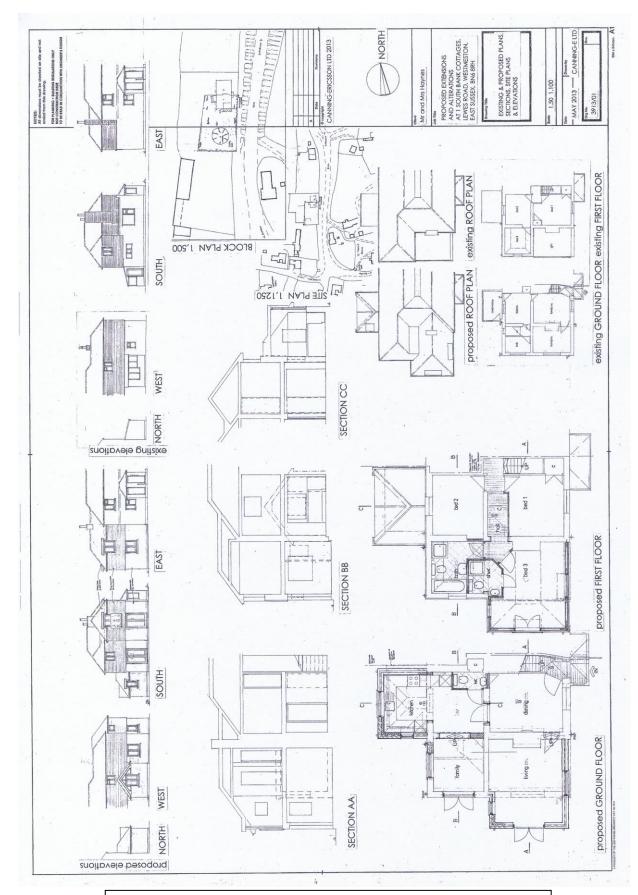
1 South Bank Cottages, Westmeston: Development Plan
